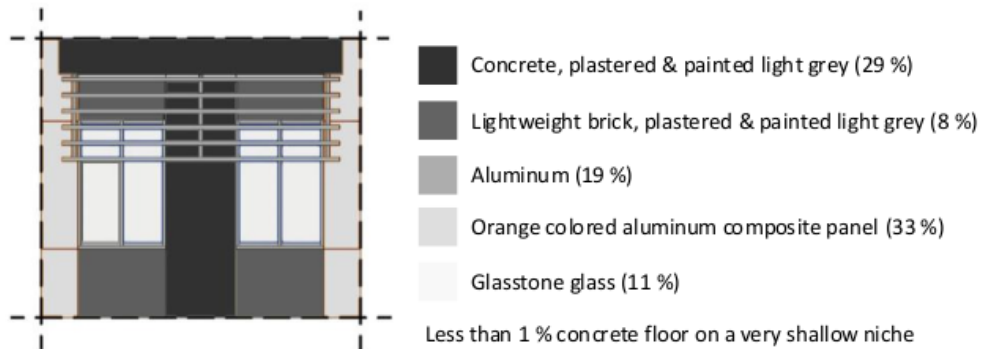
Façade of apartment units with glass windows in a niche (A apartment).
